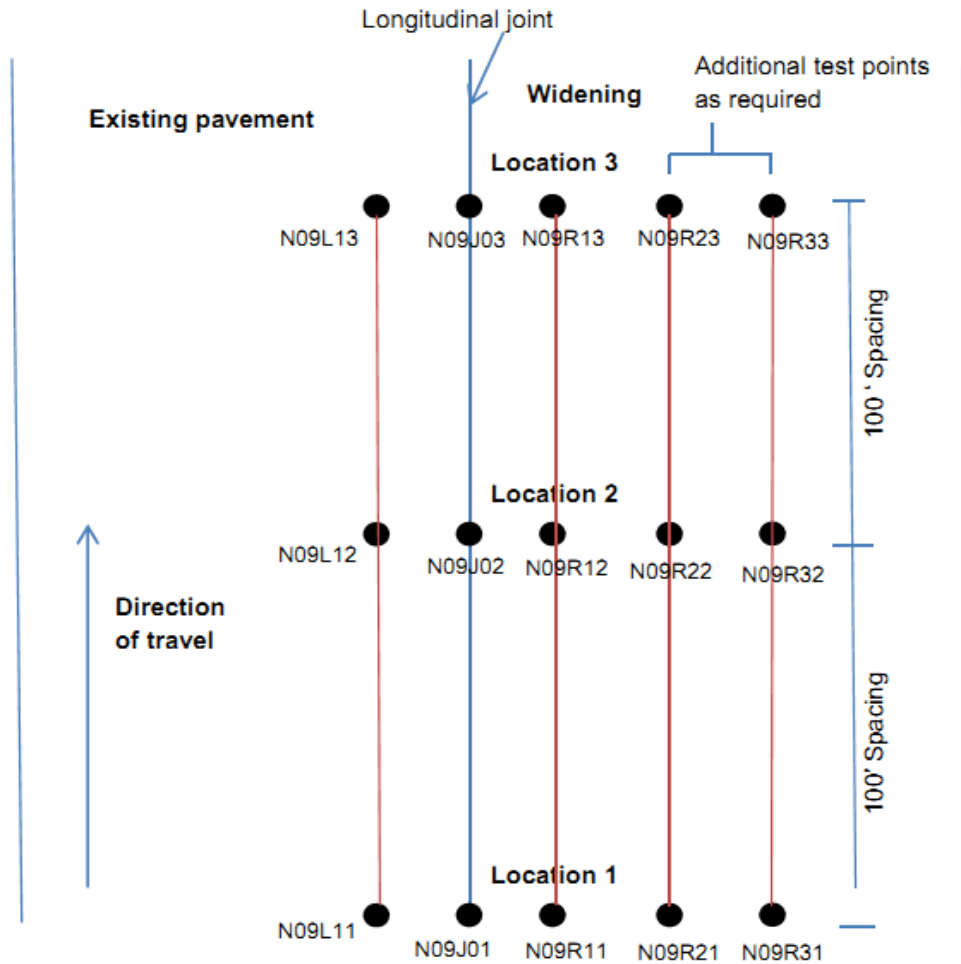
Diagram. Spacing and Number of Locations per Road Project
